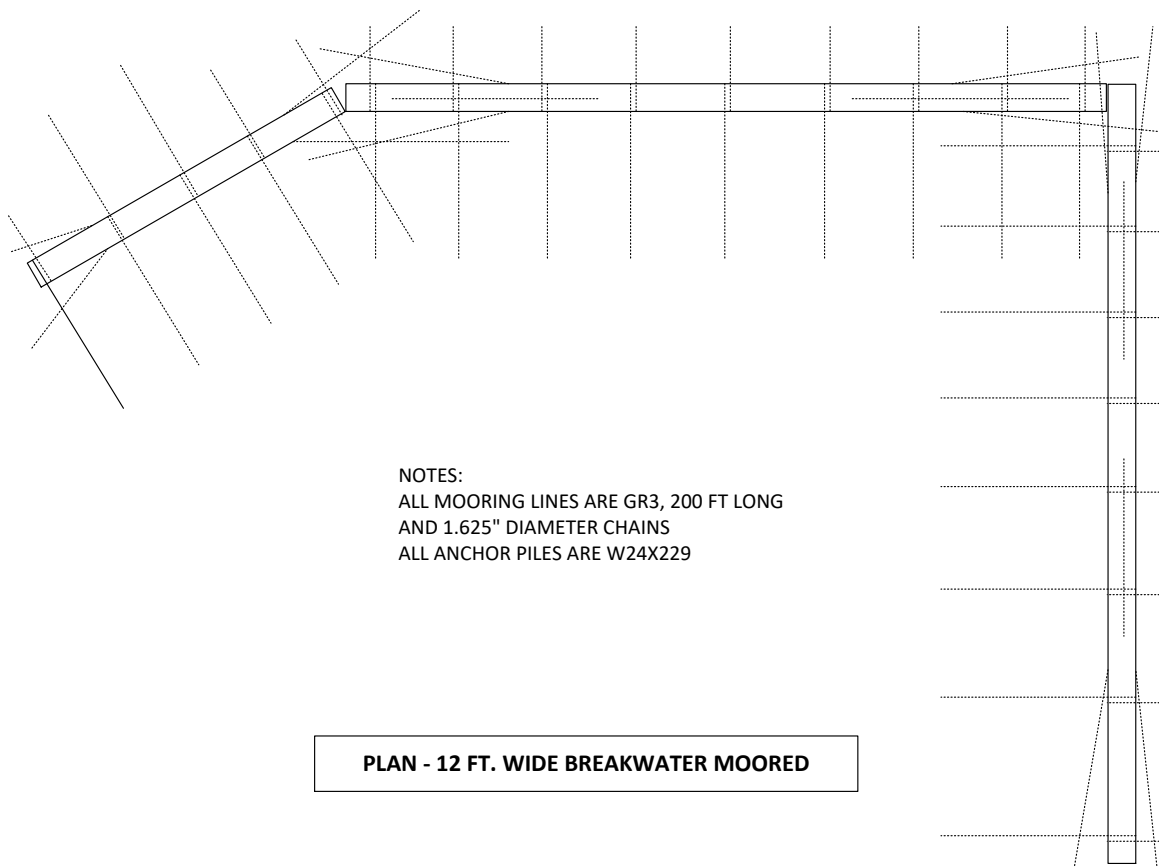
Typical Cable Mooring System Installation Plan for 12' Wide Floats (60 Cables)
